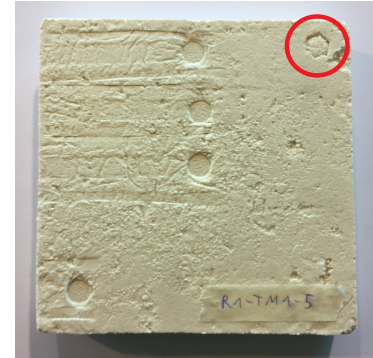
Sample R1-TM1-5. Imprint of M8 bolt indicated.
